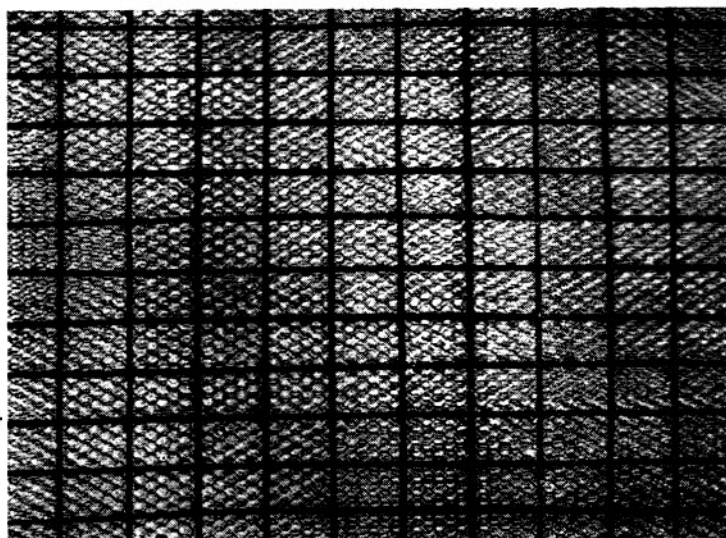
4 layers of chicken wire mesh fastened on either side of the mild steel rod frame work.
